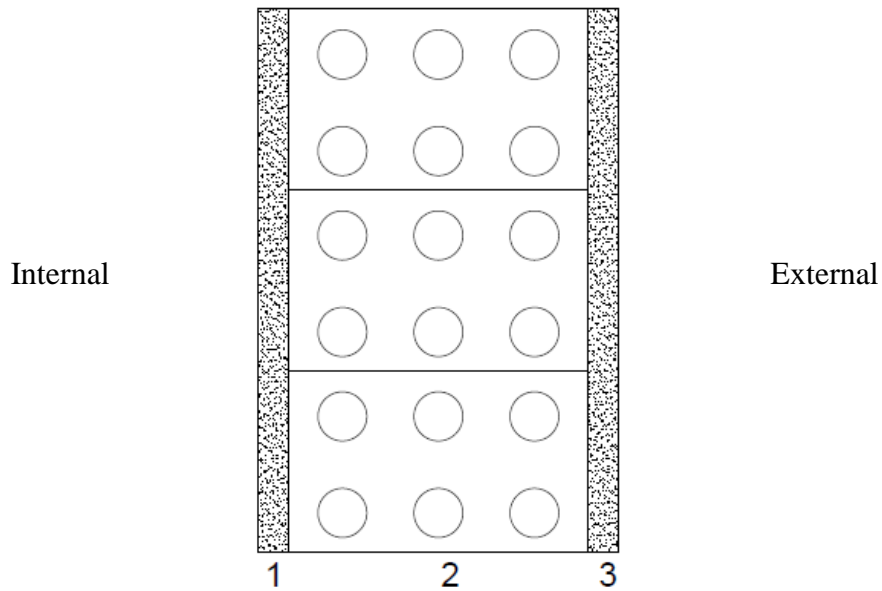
Typical topology detail of a wall with thermal insulation plaster
